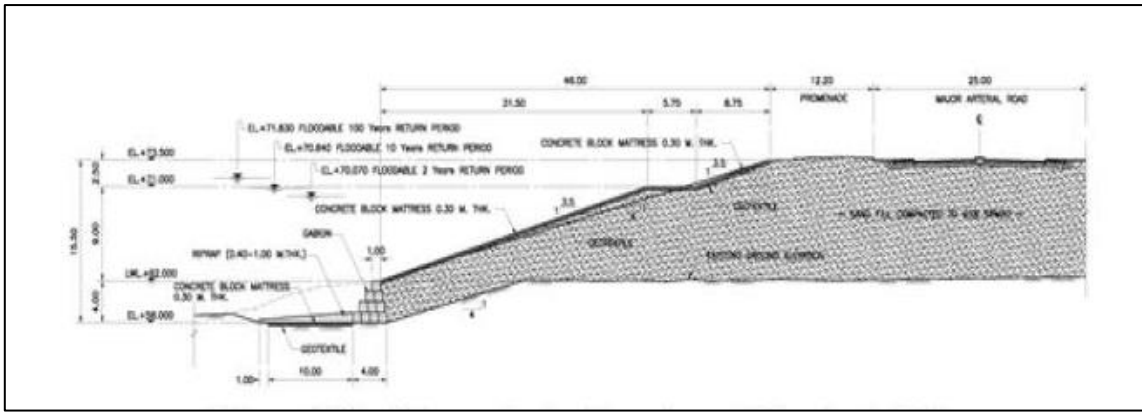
Section of Waterfront (gabion + concrete block matterss) Alternative 4
